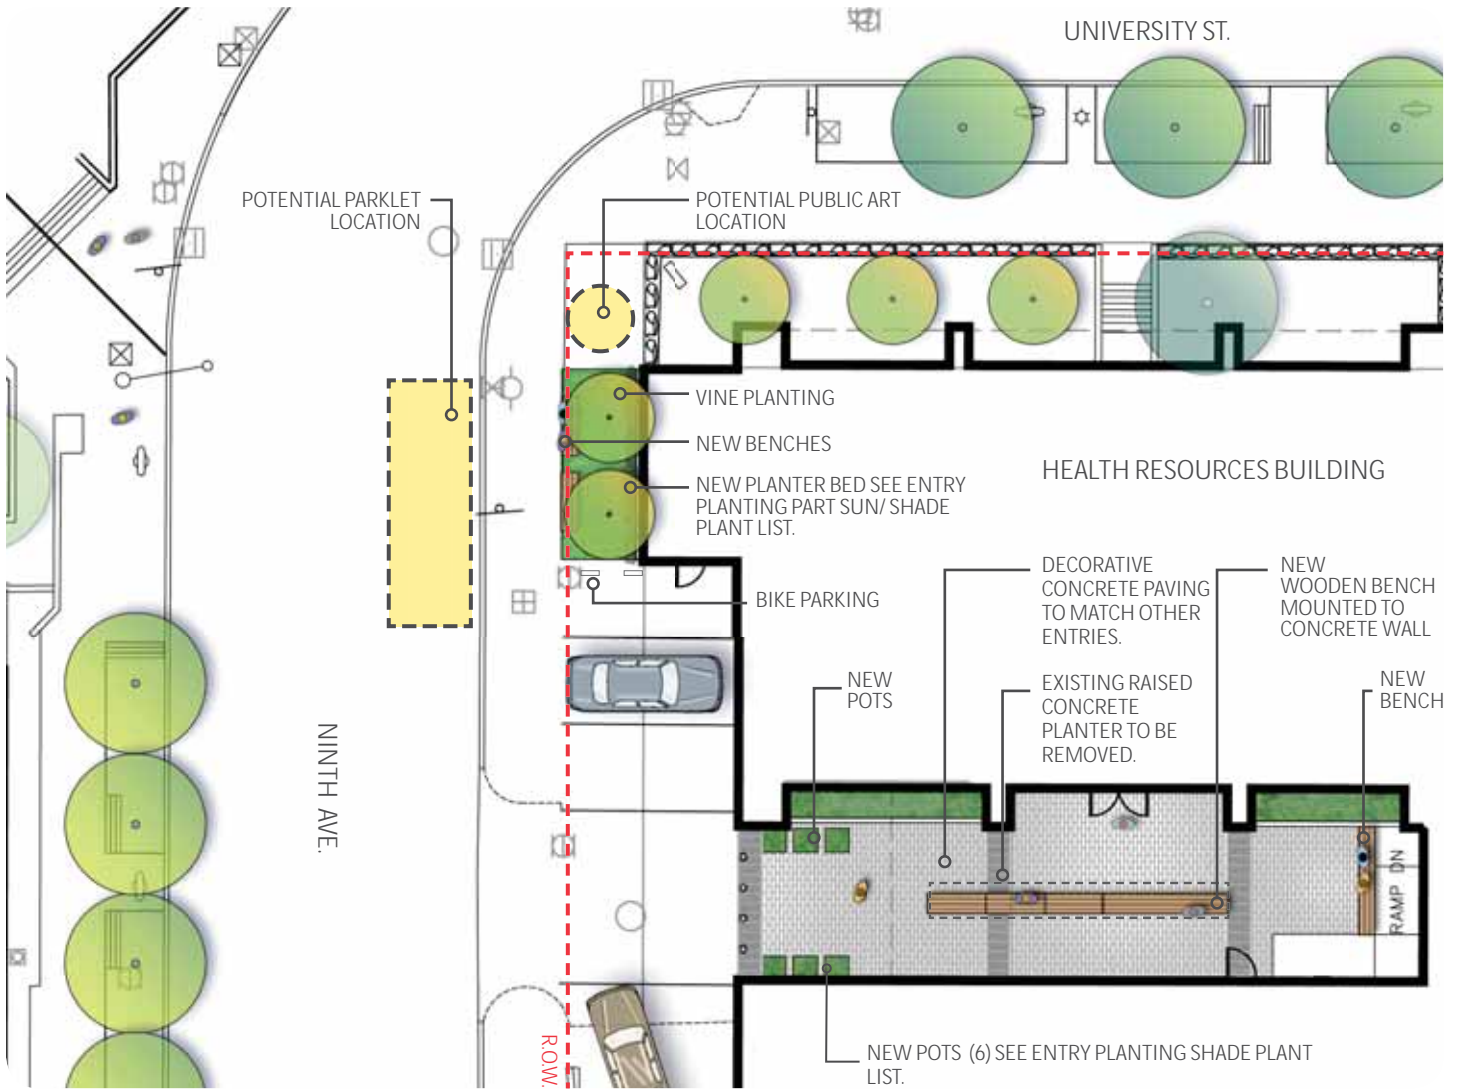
HEALTH RESOURCES BUILDING (HRB) NORTH ENTRY
